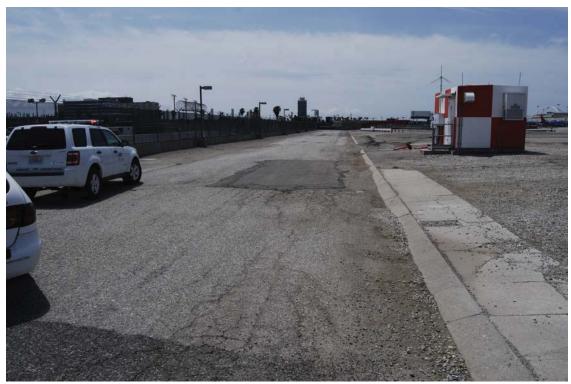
El Manor Avenue, Located at the Eastern End of Runway 6R-24L, facing south. FAA localizer equipment (navigational aid) is housed in the structure shown in the upper right portion of the photo.
